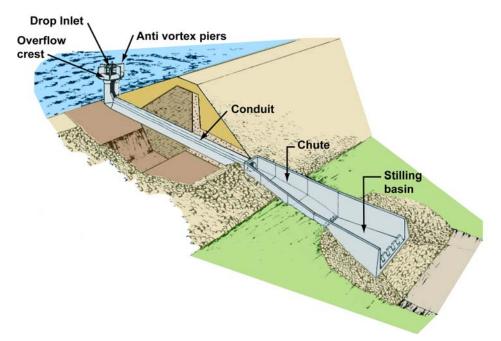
A drop inlet spillway conduit through an embankment dam.
